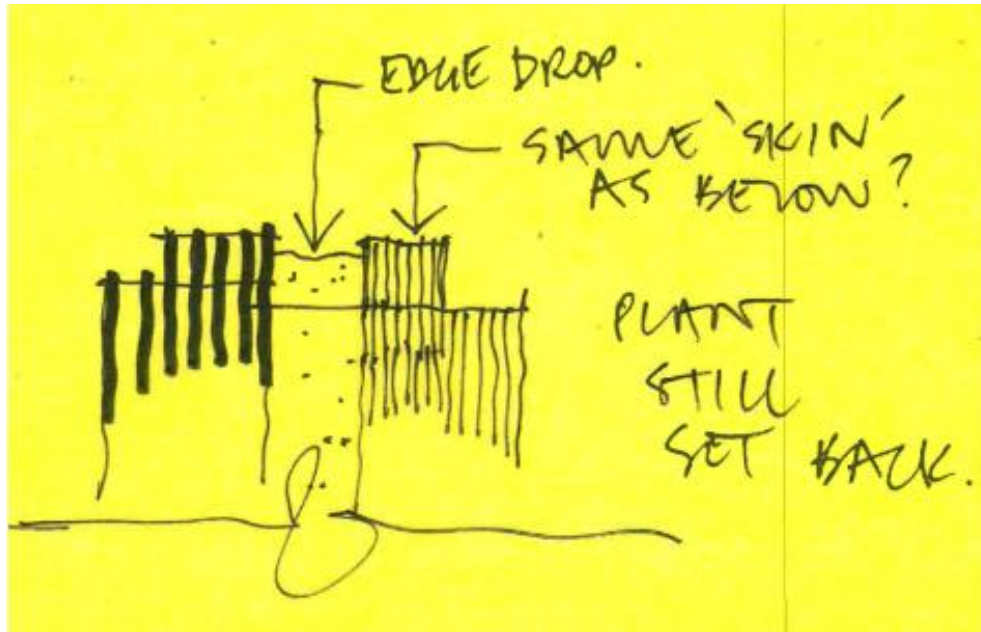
Concept prepared by Hassell Architects to integrate the tower facade language with the roof plant
